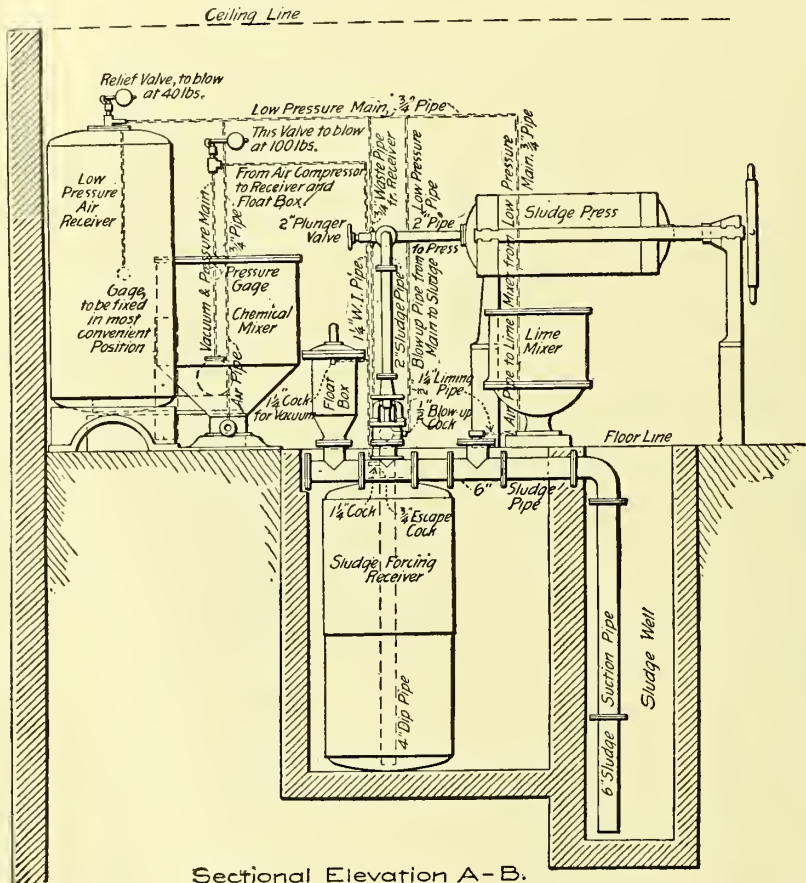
DETAILS OF SLUDGE COMPRESSORS, LONG BRANCH, NEW JERSEY.
